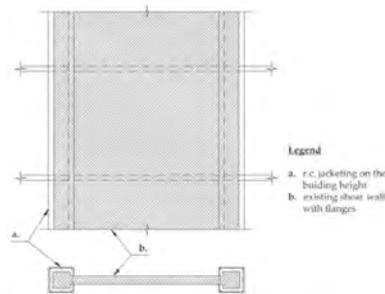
Strengthening solution for structural walls, with RC jacketing interventions on the edges (adapted after [34]).
